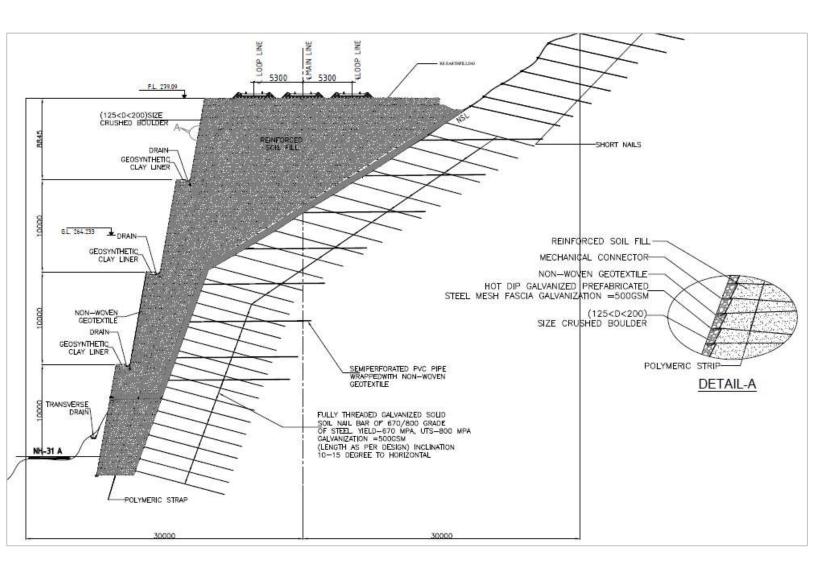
Typical Cross-section of proposed RE Wall at Melli Yard
